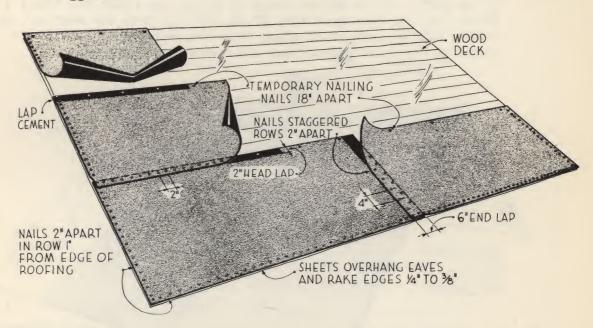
Exposed nail application of roll roofing parallel to the eaves.
